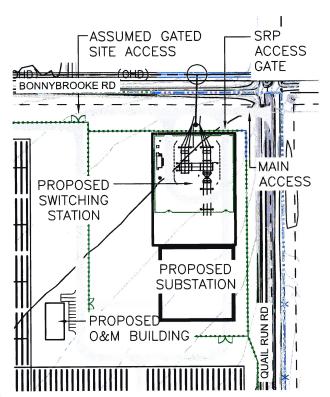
Bonnybrooke Solar Project Conceptual Layout Detail. This figures shows the access driveway and proposed switching station, substation, and operations and maintenance building.
